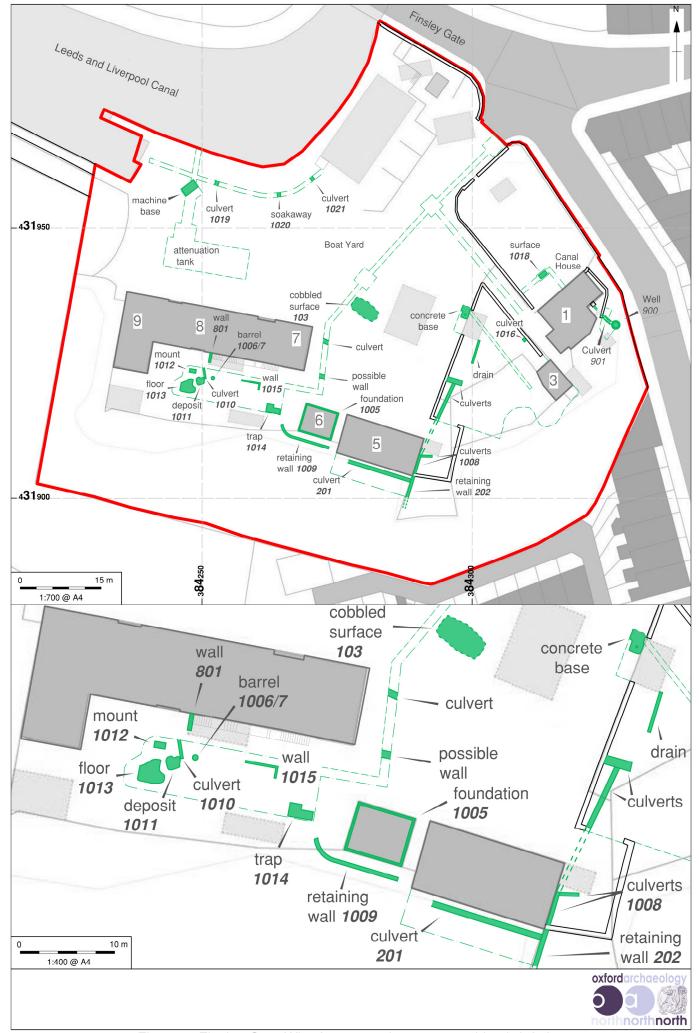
Finsley Gate Wharf regeneration area watching brief plan
